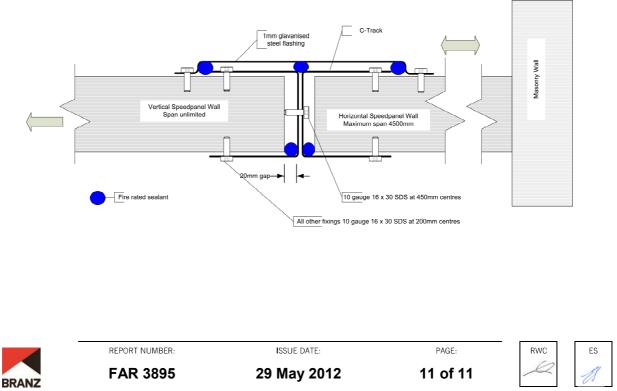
90° Junction detail between a horizontal and vertical Speedpanel wall
